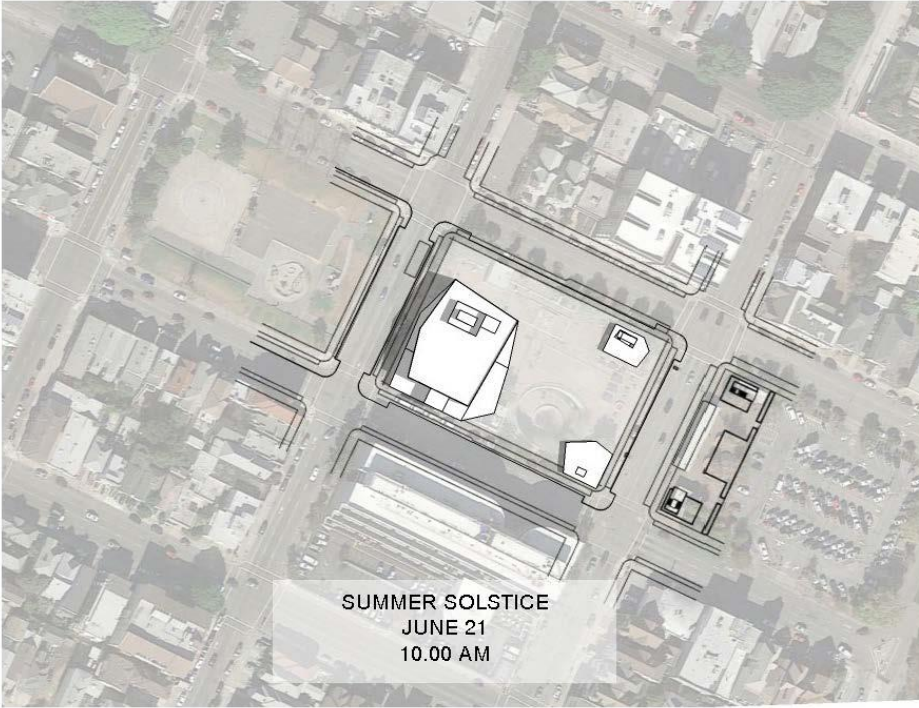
Shadows cast by the proposed TOF building on summer solstice at 10 a.m.
